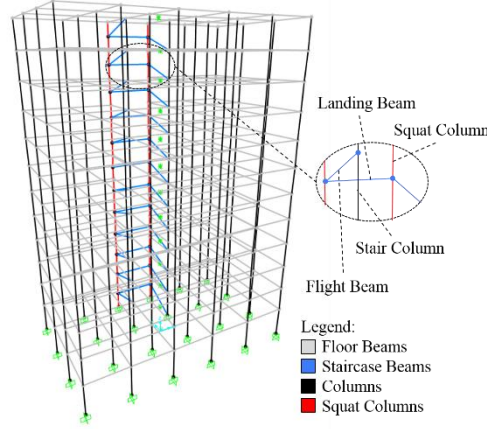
Numerical model of the benchmark building and identification of structural element groups: floor beams, staircase beams, columns, and squat columns.
